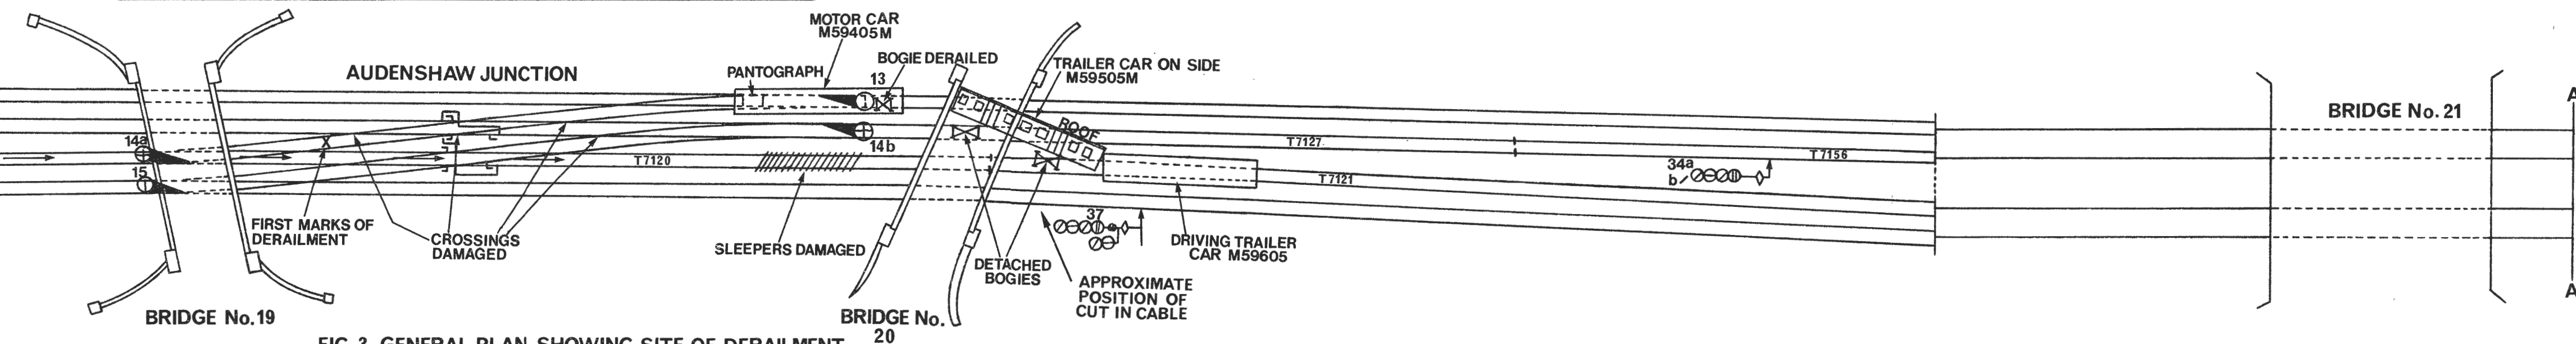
GENERAL PLAN SHOWING SITE OF DERAILMENT
